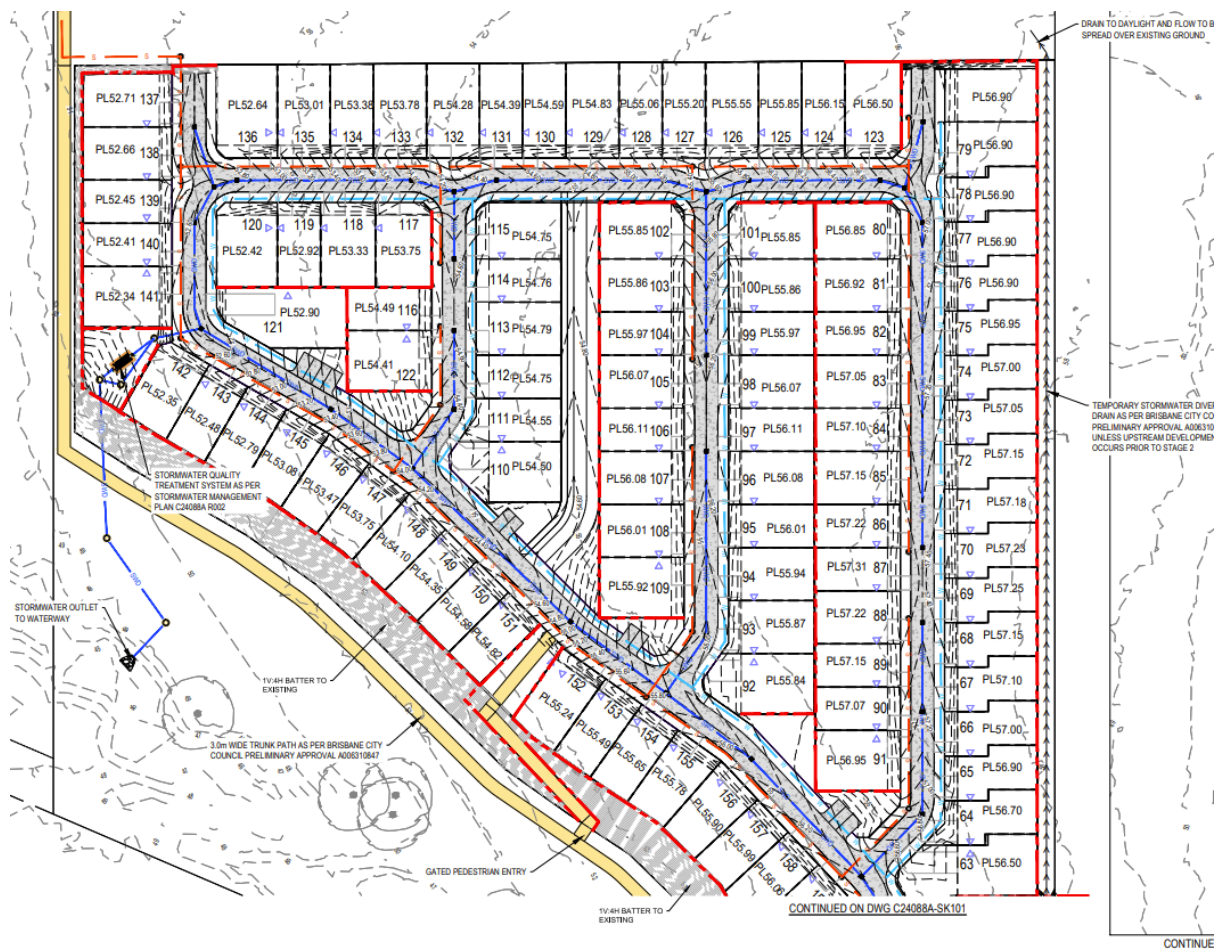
Extract from Stormwater Management Plan for application for Development Permit (MCU) at 323 Rochedale Road (A006826637) – demonstrating that built form extent has followed ground-truthed waterway mapping as part of development proposal
